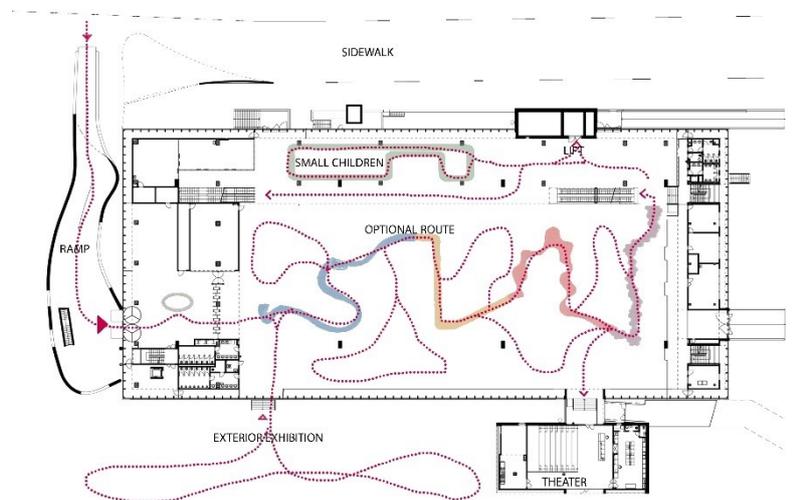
VIDA! Science Centre in Brno, Czech Republic: Ground Floor. (Source: Floor plan by K4 with markings by Filová, 2021)
